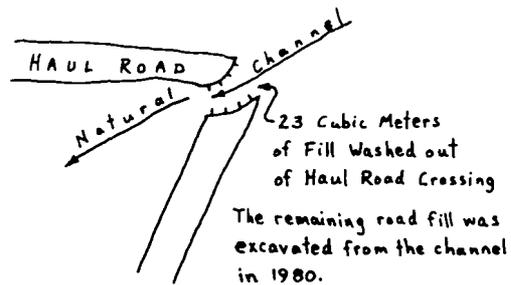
Failure of Earth Fill at Haul Road Crossing of Stream
